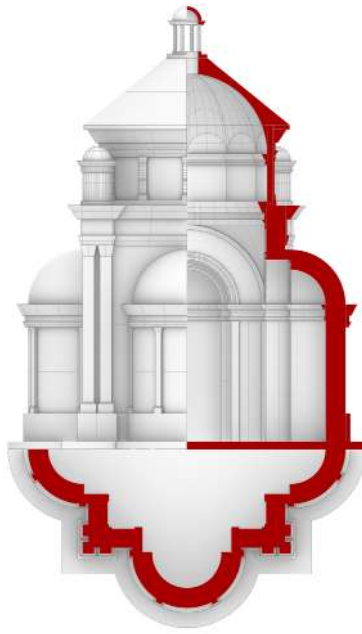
Plan, section and elevation (1:500) of the solution with an umbrella dome and an exterior circle-based drum.
